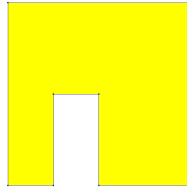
Geometry of a 4 m x 4 m façade exhibiting façade ID 1.
